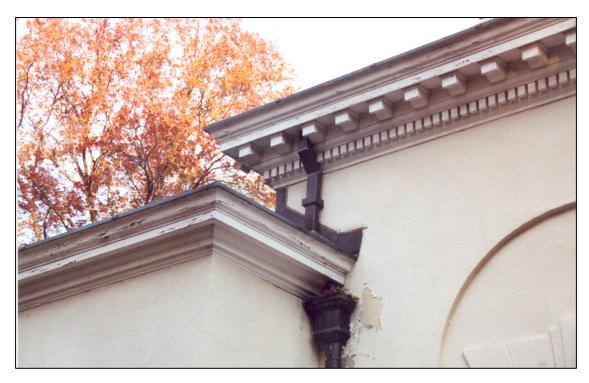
Morristown Museum Building: south façade, eaves detail of junction of main/front structure and west wing (2001).
